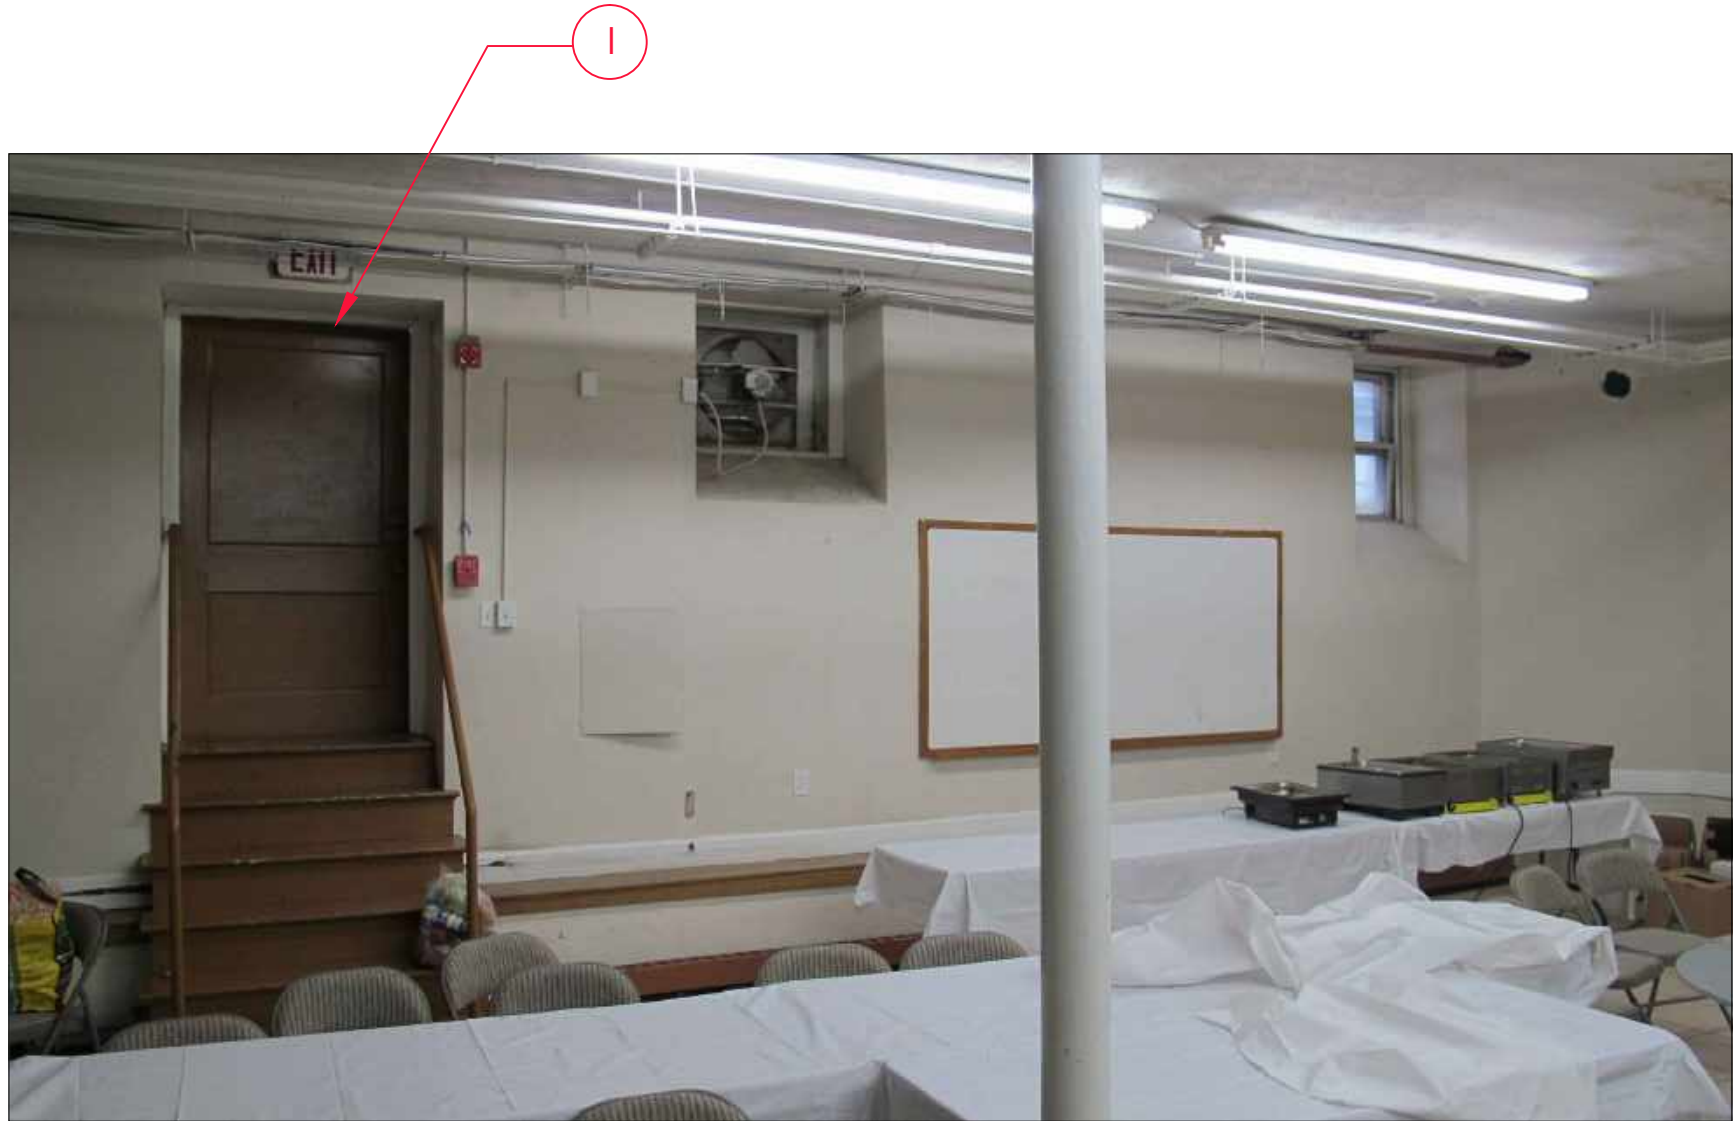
Existing Social / Dining area at basement. The existing floor elevation will be raised to match adjacent Kitchen and Stage floor elevations.
